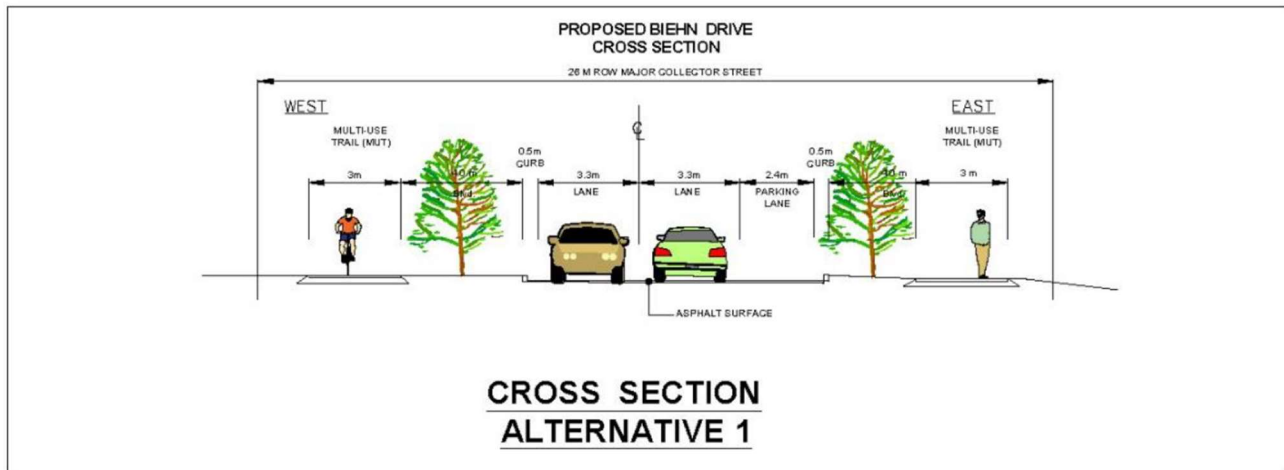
Cross Section Alternative 1 (Beyond the Wetland)
